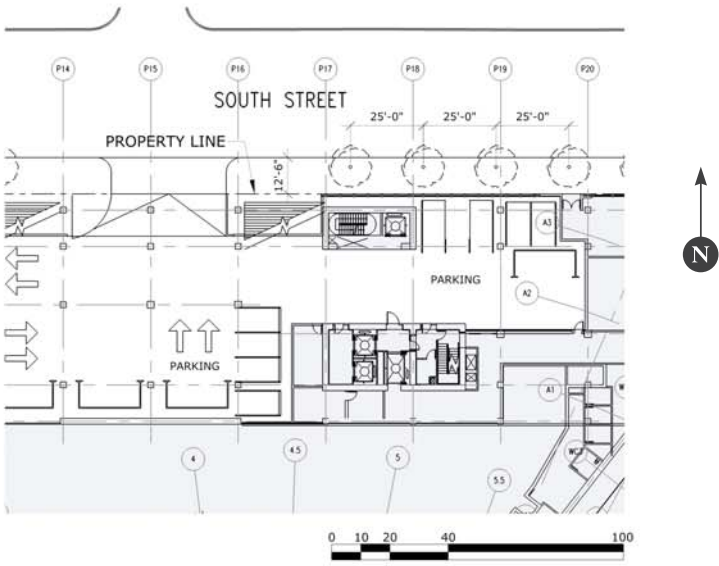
| SOUTH ST RETAIL AND GARAGE STREET LEVEL PLAN
